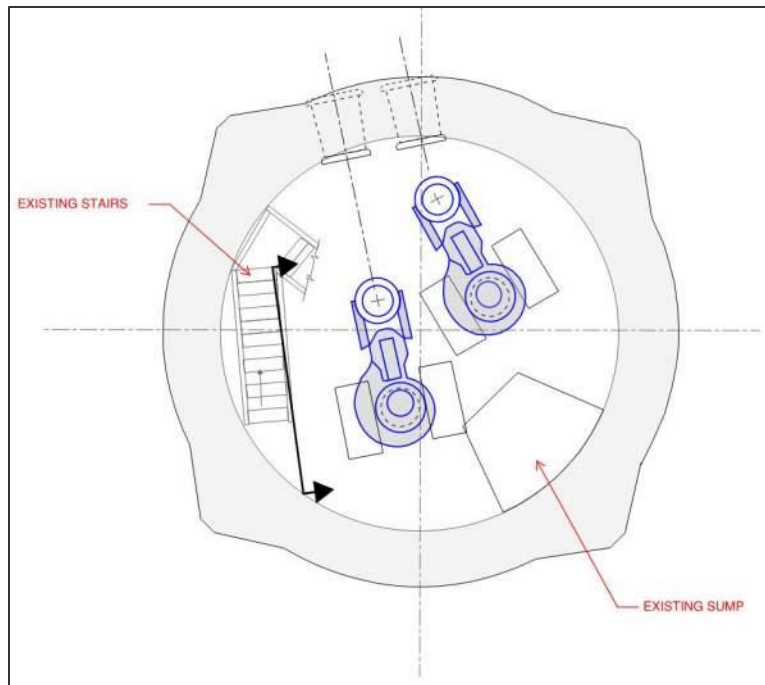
Plan View of Vertical Dry Pit Submersible Pumps 9 and 10
